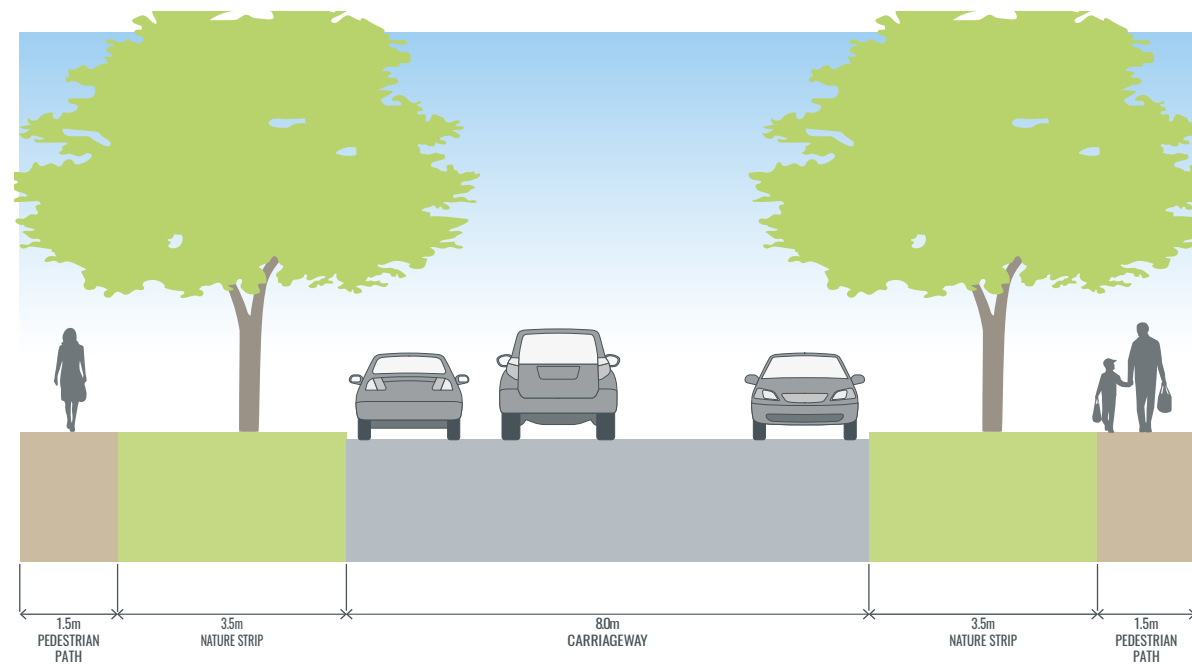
LOCAL ACCESS STREET - LEVEL 1 (18.0M)
